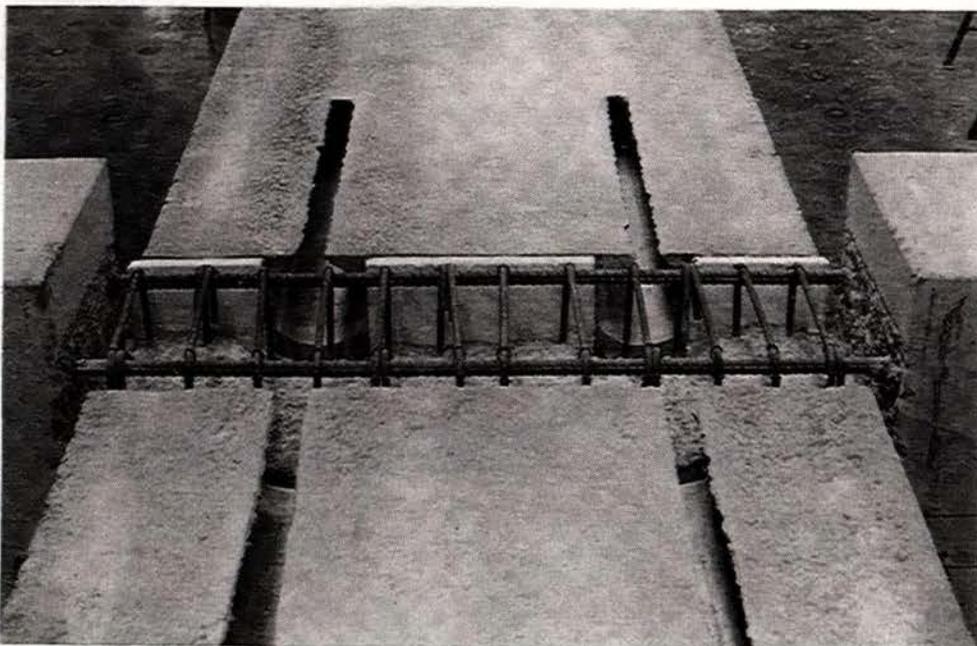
Pouring of Cast-in-Place Topping Concrete Specimen 1
